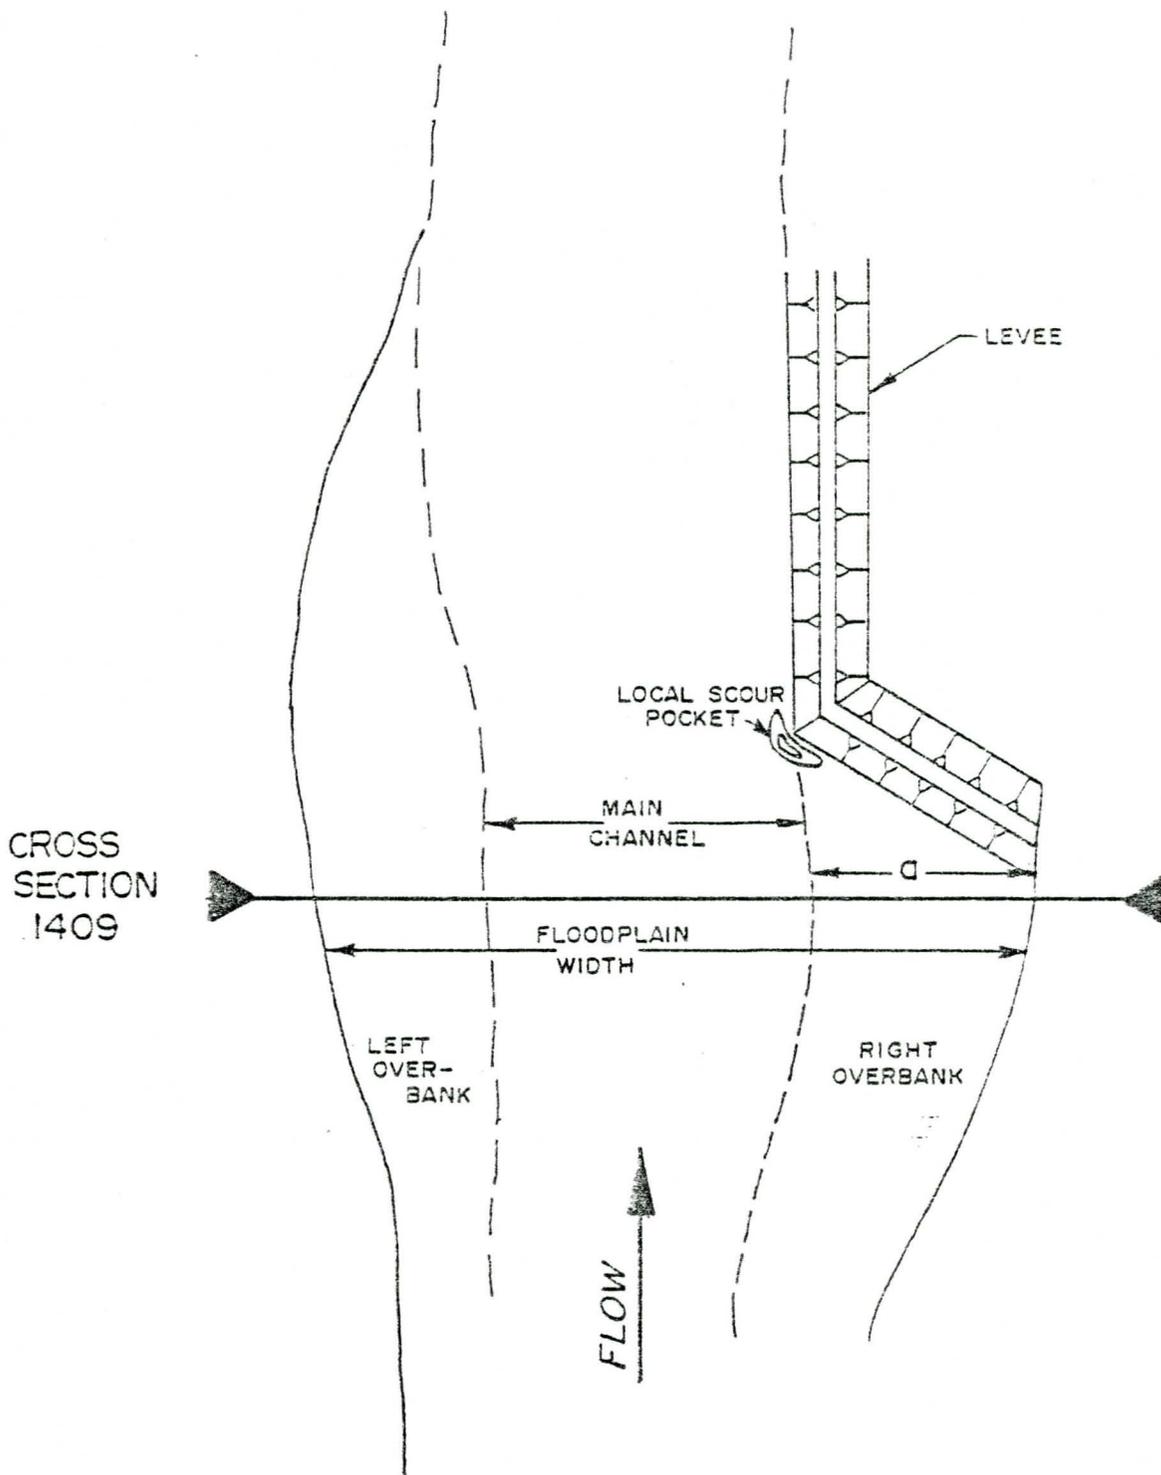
Plan view of levee alignment analyzed in local scour evaluation.
